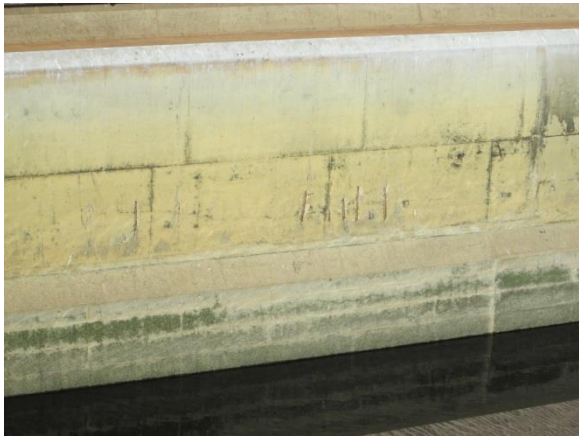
Spalling over vertical bars in west (dividing) wall.
